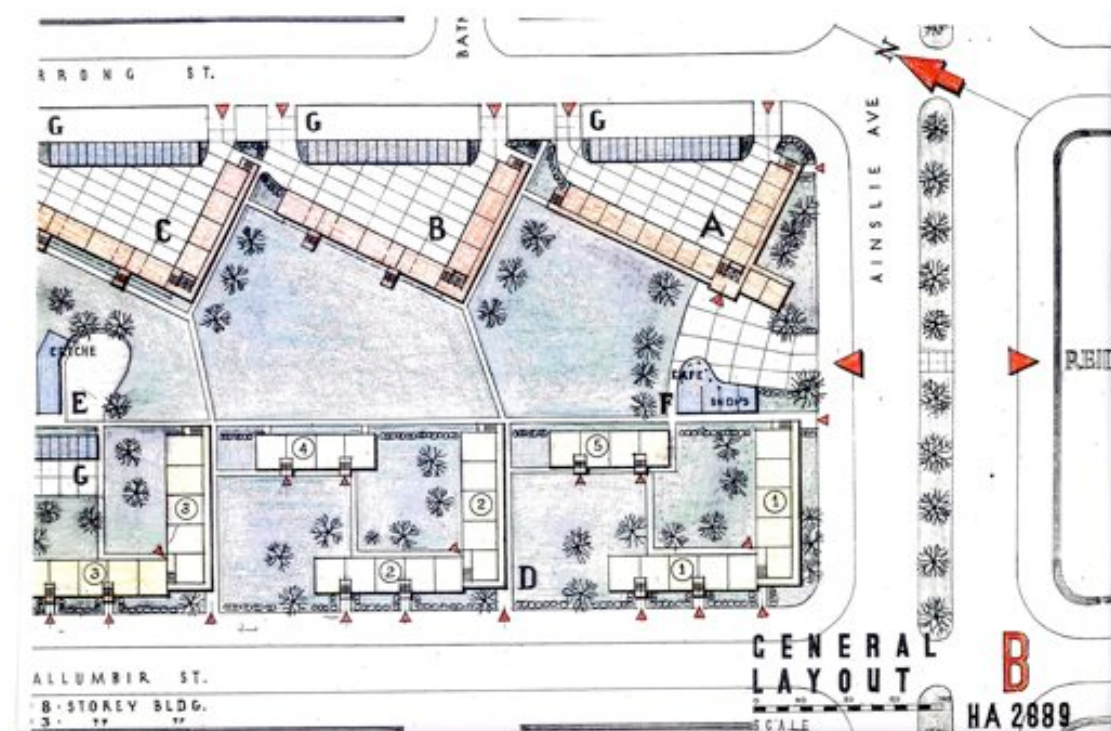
scheme “B” site plan, Braddon Flats, Canberra. Department of Works, 1953. The proposed café and shops were later deleted because of the proximity to the city. The view of the eight-storey flats from the end of Batman Street (top of picture) had some Committee members concerned.
